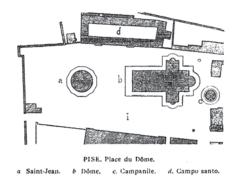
Pisa. Piazza dei Miracolli. Plan. From Martin, L'Art de bâtir les villes.
